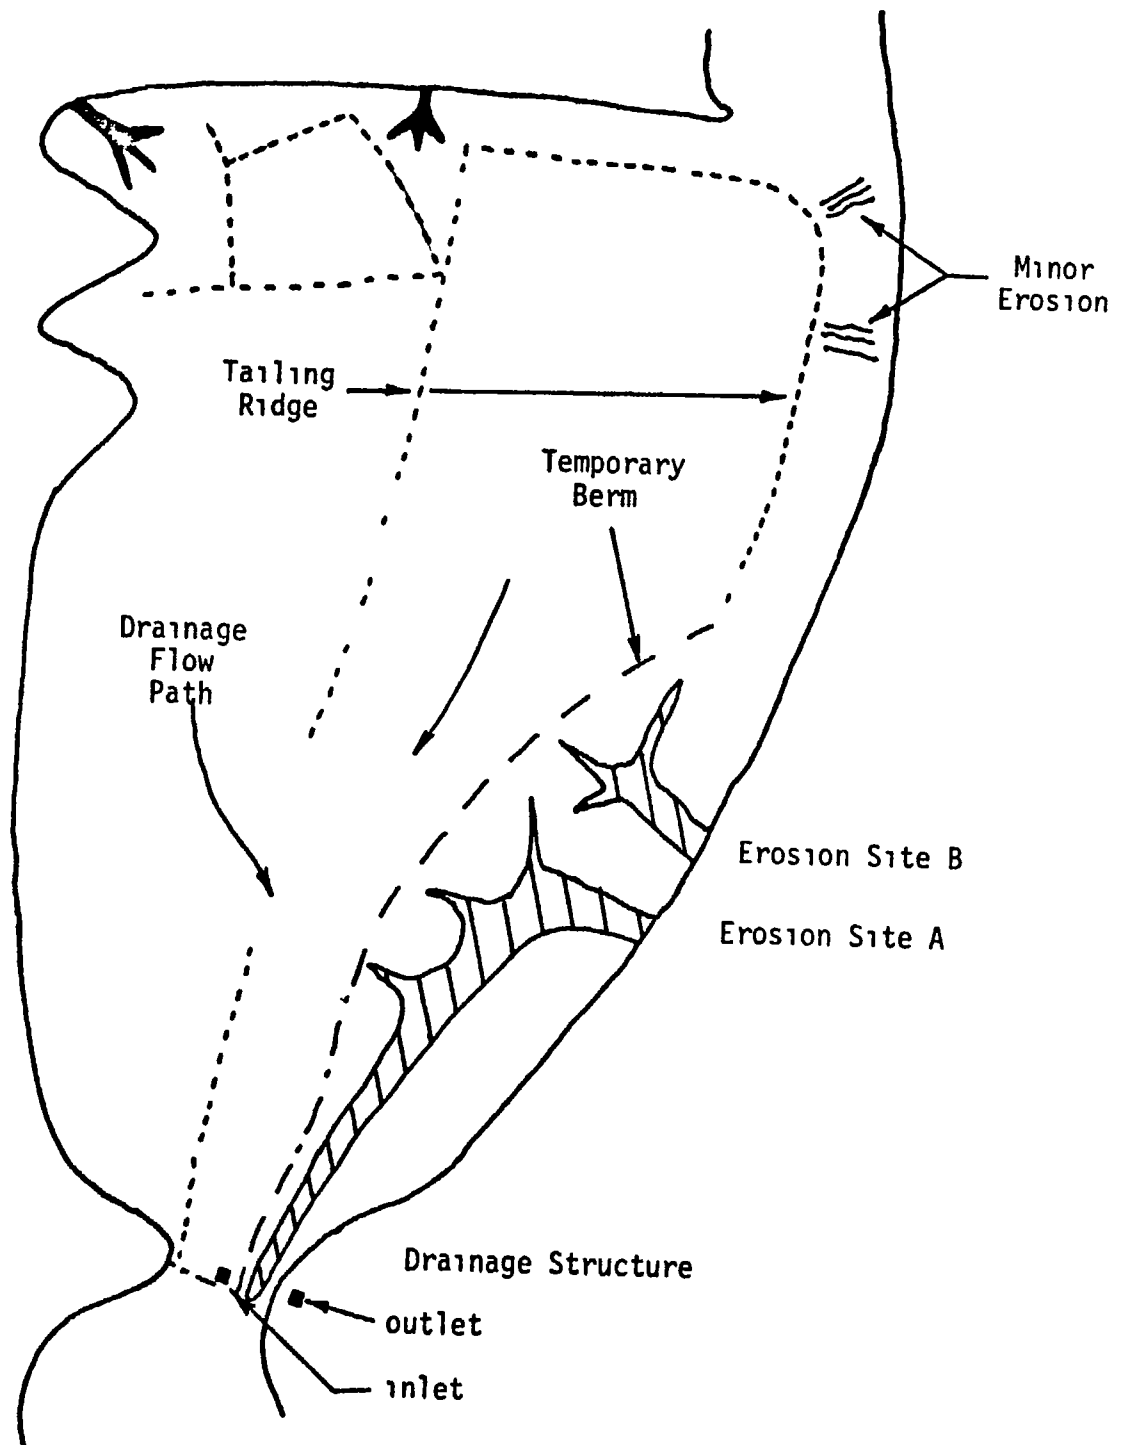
Plan View of the Upper Portion of the Tailing Pile
